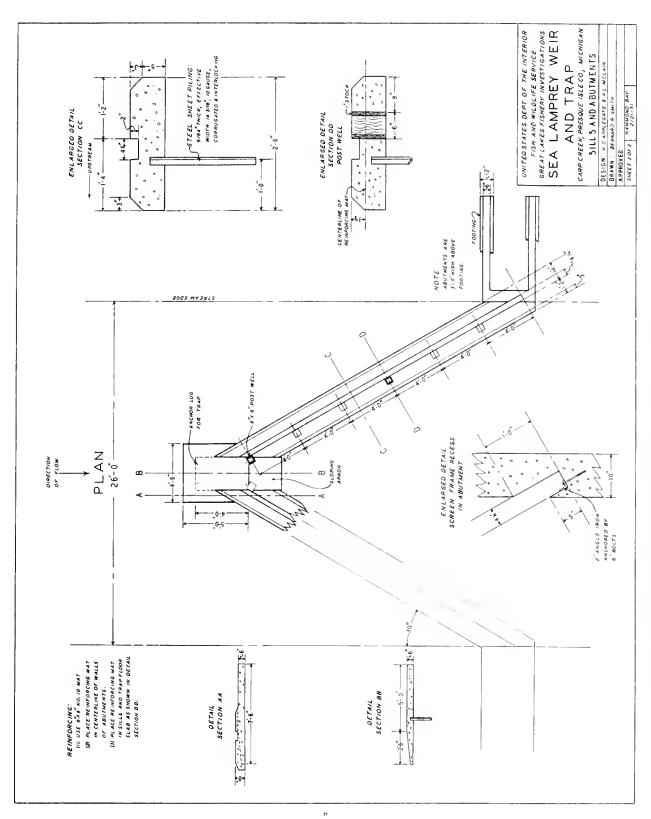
Diagrammatic plans of concrete sills, trap bese, and abutments used to provide permanent base for portable-type sea-lamprey weir and trap.
